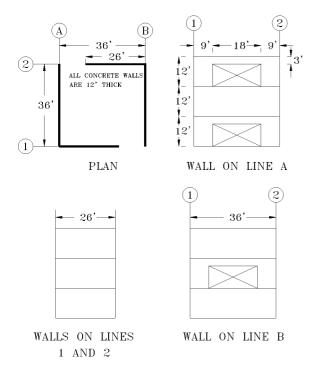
Altered plan and elevation of the three story shear wall building (Note the abrupt change of stiffness along the height of walls on lines A and B.)
